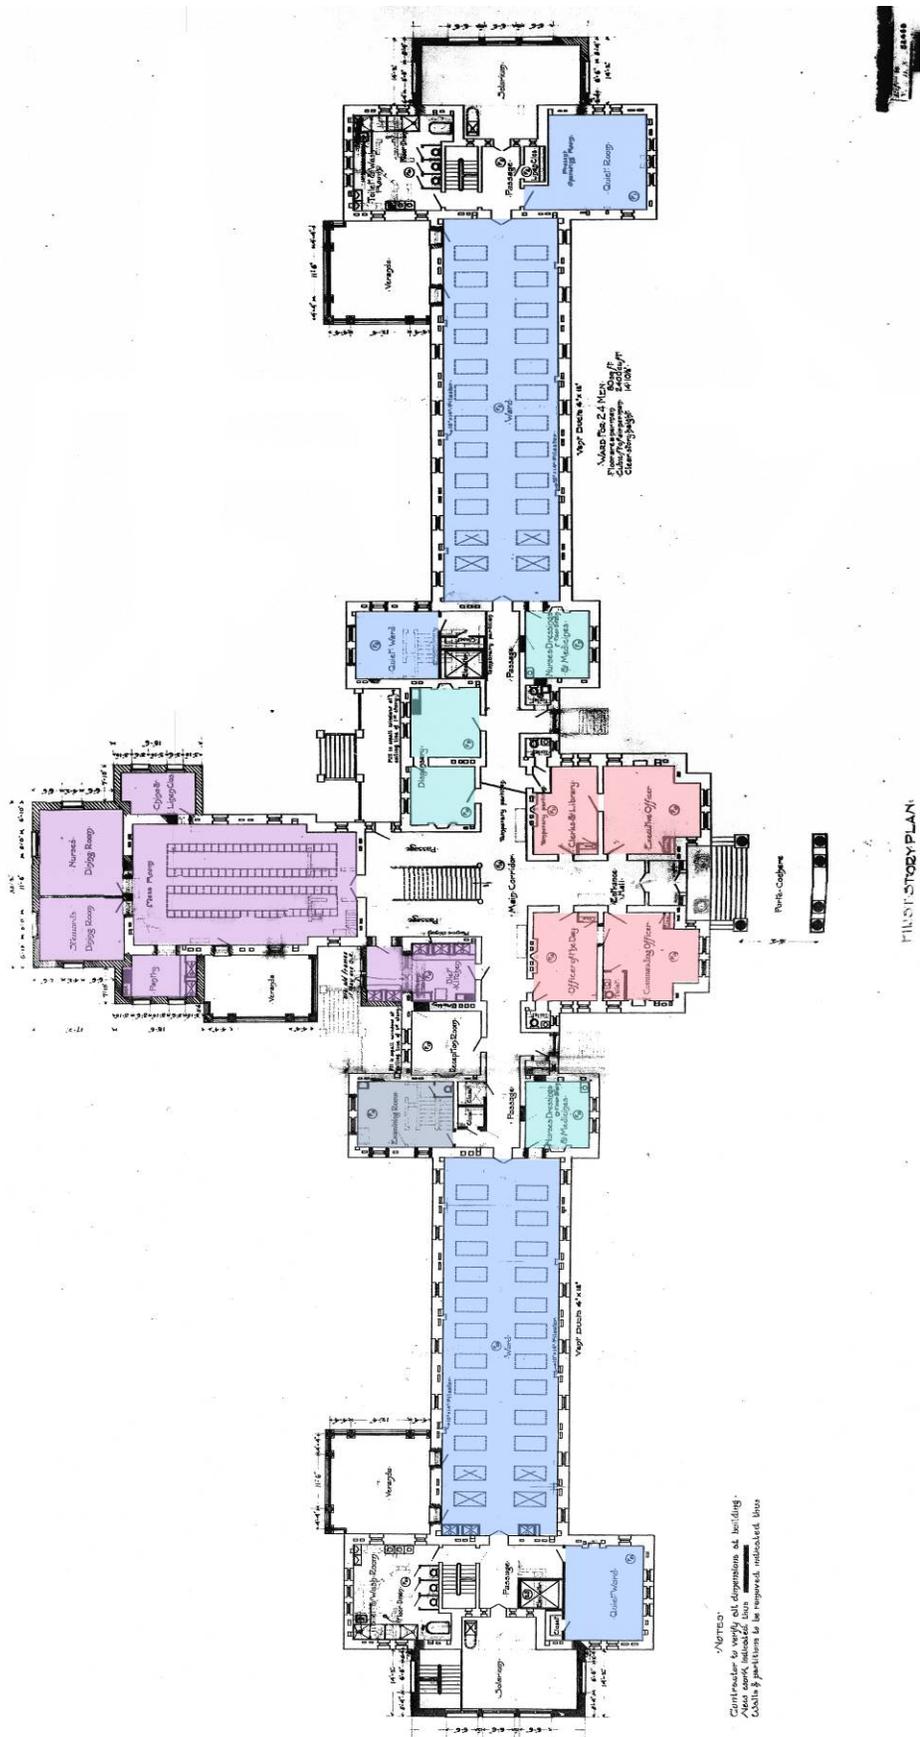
First floor plan of the second Naval Hospital Philadelphia, Pennsylvania, 1908 (NARA College Park, RG 71 427-31-2).
